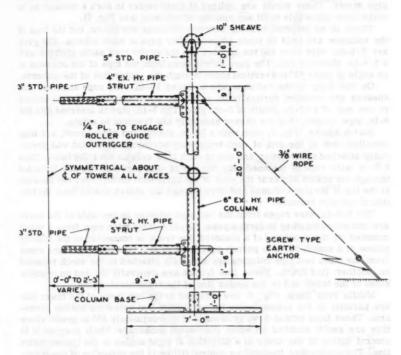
HOISTING RIG COLUMN WITH PIPE STRUTS AND GUYS
